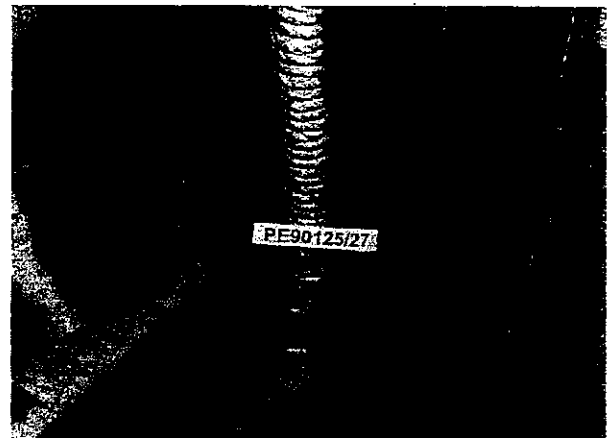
Pipe Lagging at Fibre Glass Repair Workshop, LG/F of Block 16 was confirmed as ACM (Sample No. PE90125/27, ACM Item No. ED/0011-6, photo taken on 03 Mar 2009).
